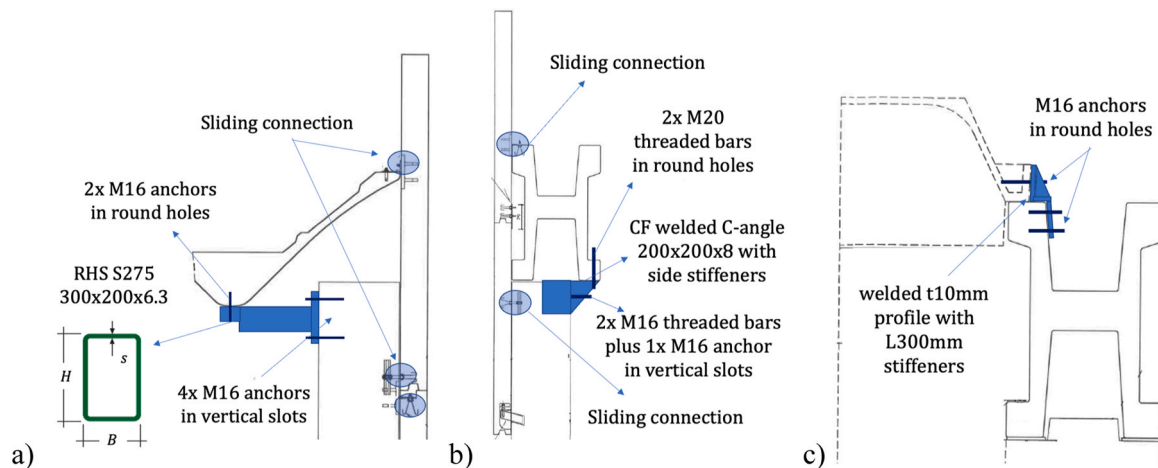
Building EE4 – retrofit interventions: (a,b) connections of cladding panel and panel-support columns to deck connections, (c) roof-to-beam connections.
